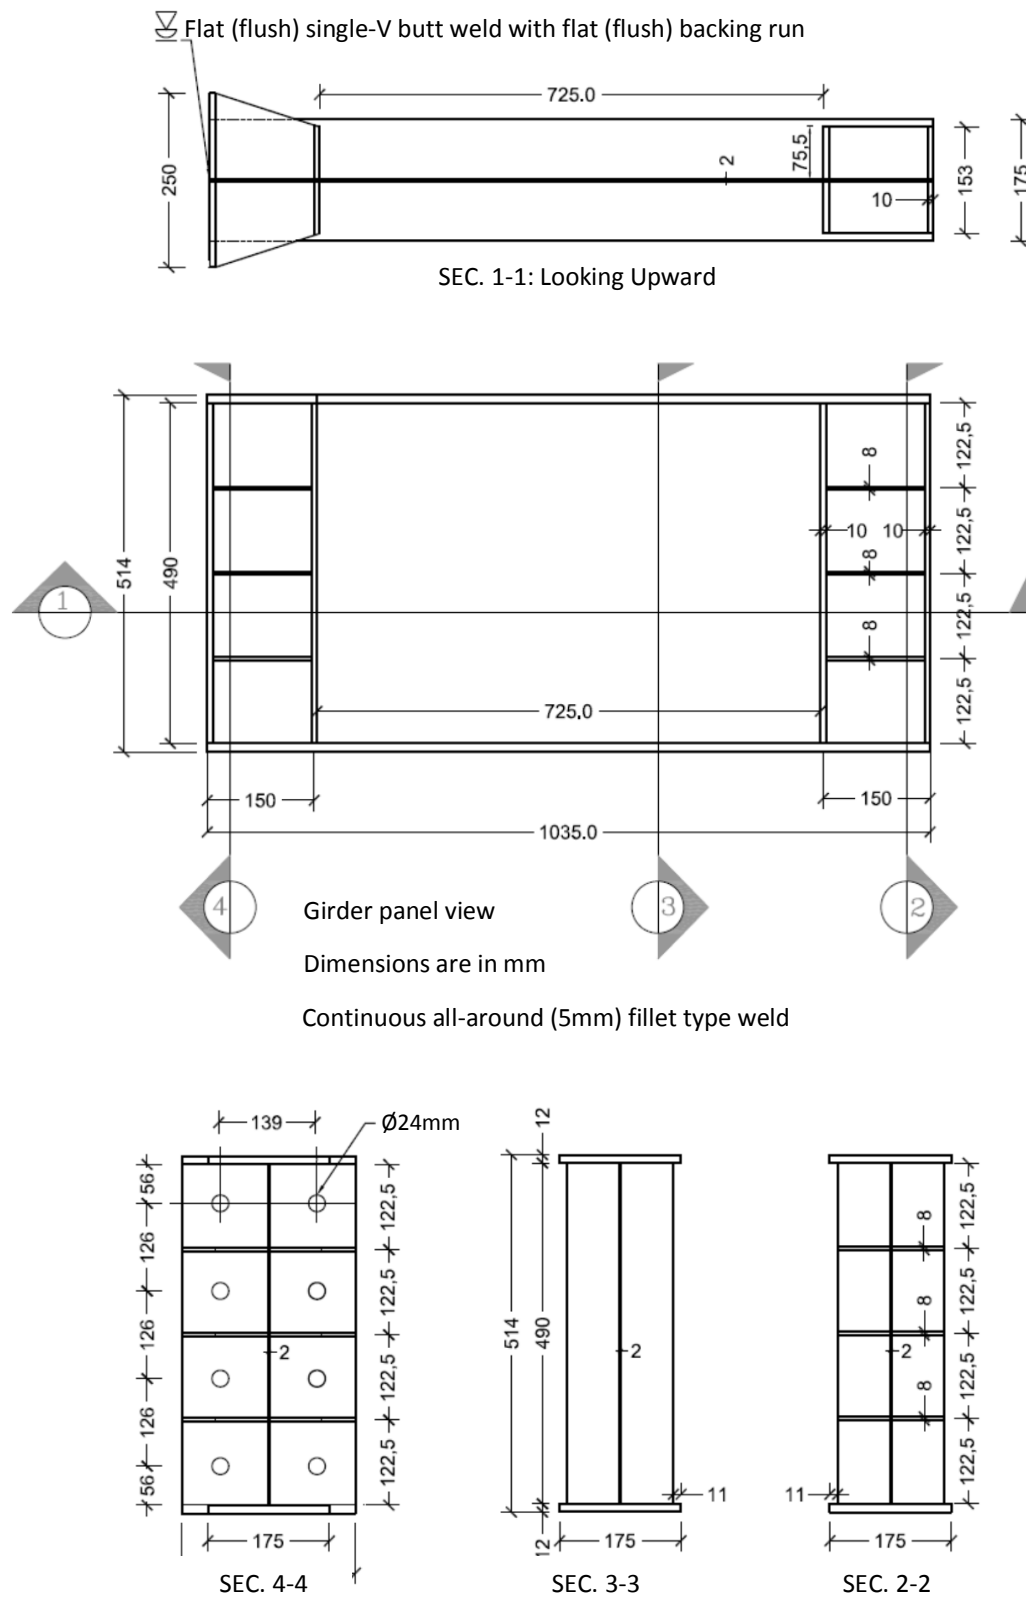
Dimensions and details of the test specimen in the final series of tests.
